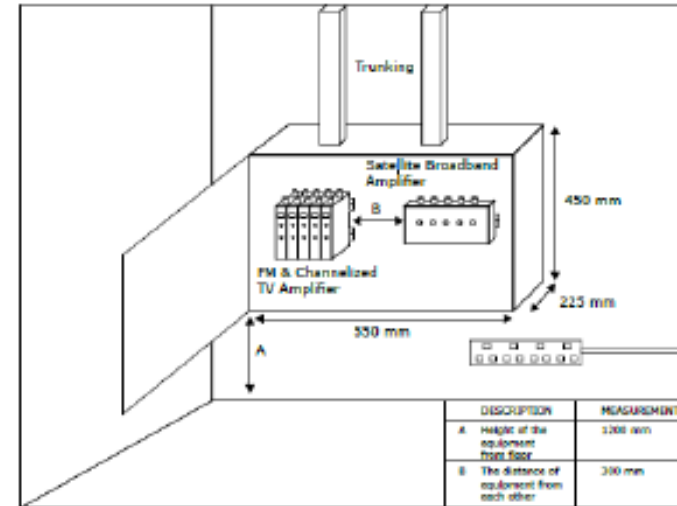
Recommended Head-end equipment arrangement (wall mounted type)
